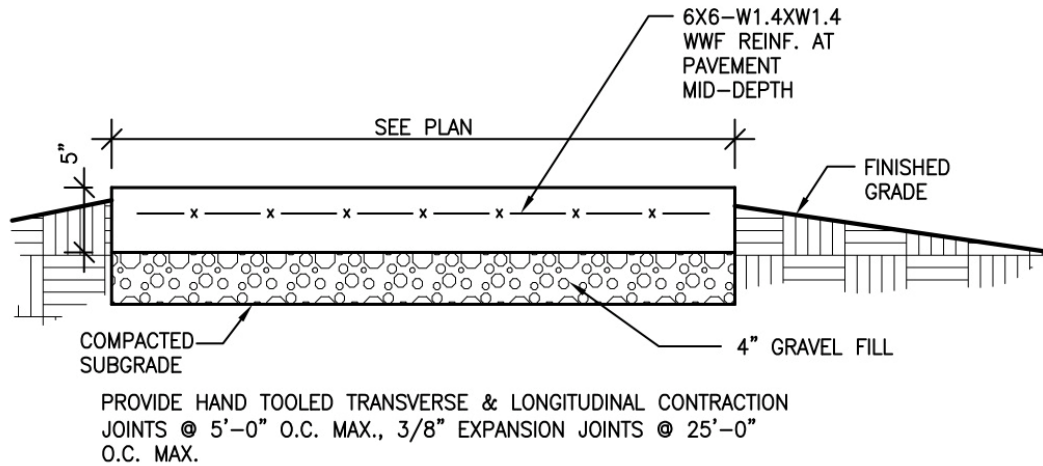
Concrete pavement detail for outdoor patio and sidewalks.
